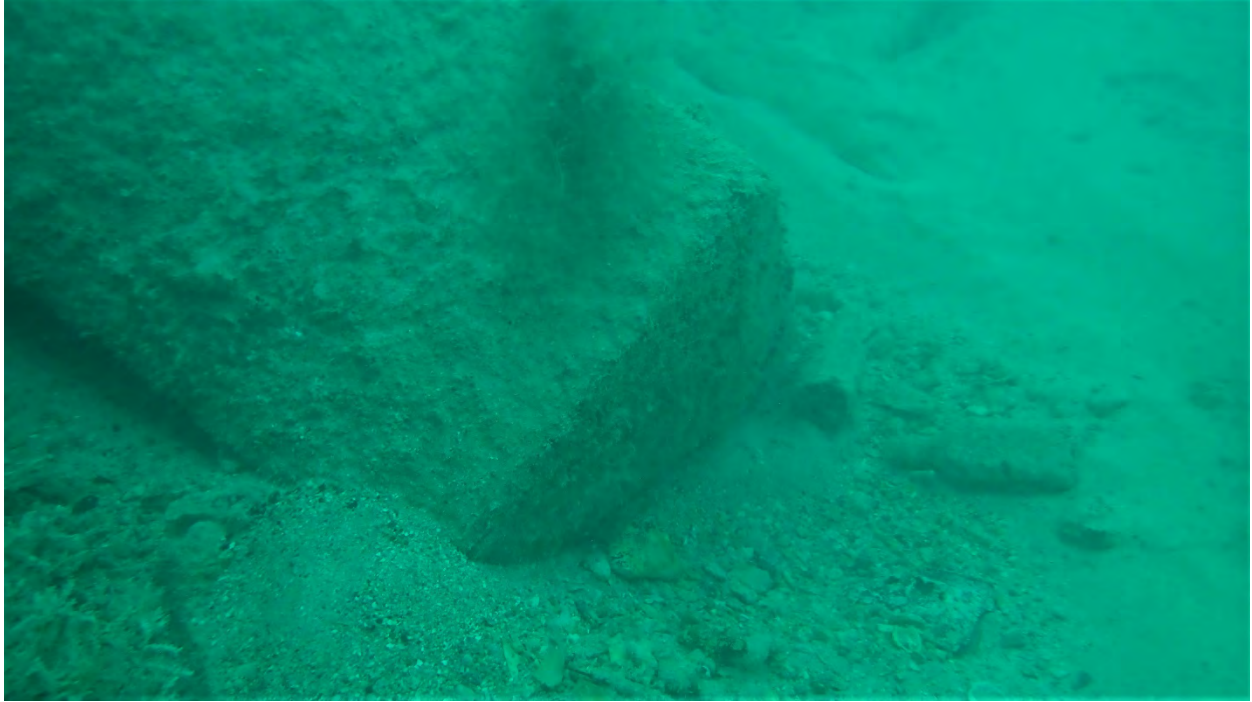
Typical piling at Mallory Pier with dense cover of sponges and invertebrates.
